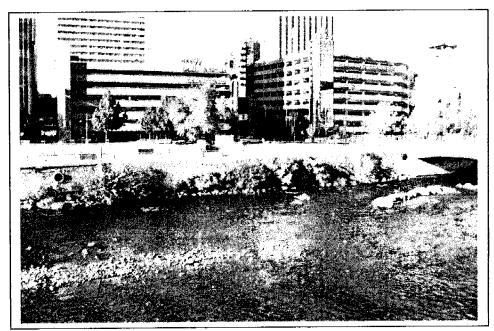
Section K. north bank. West Street Plaza, camera facing northeast, 2/7/02.
